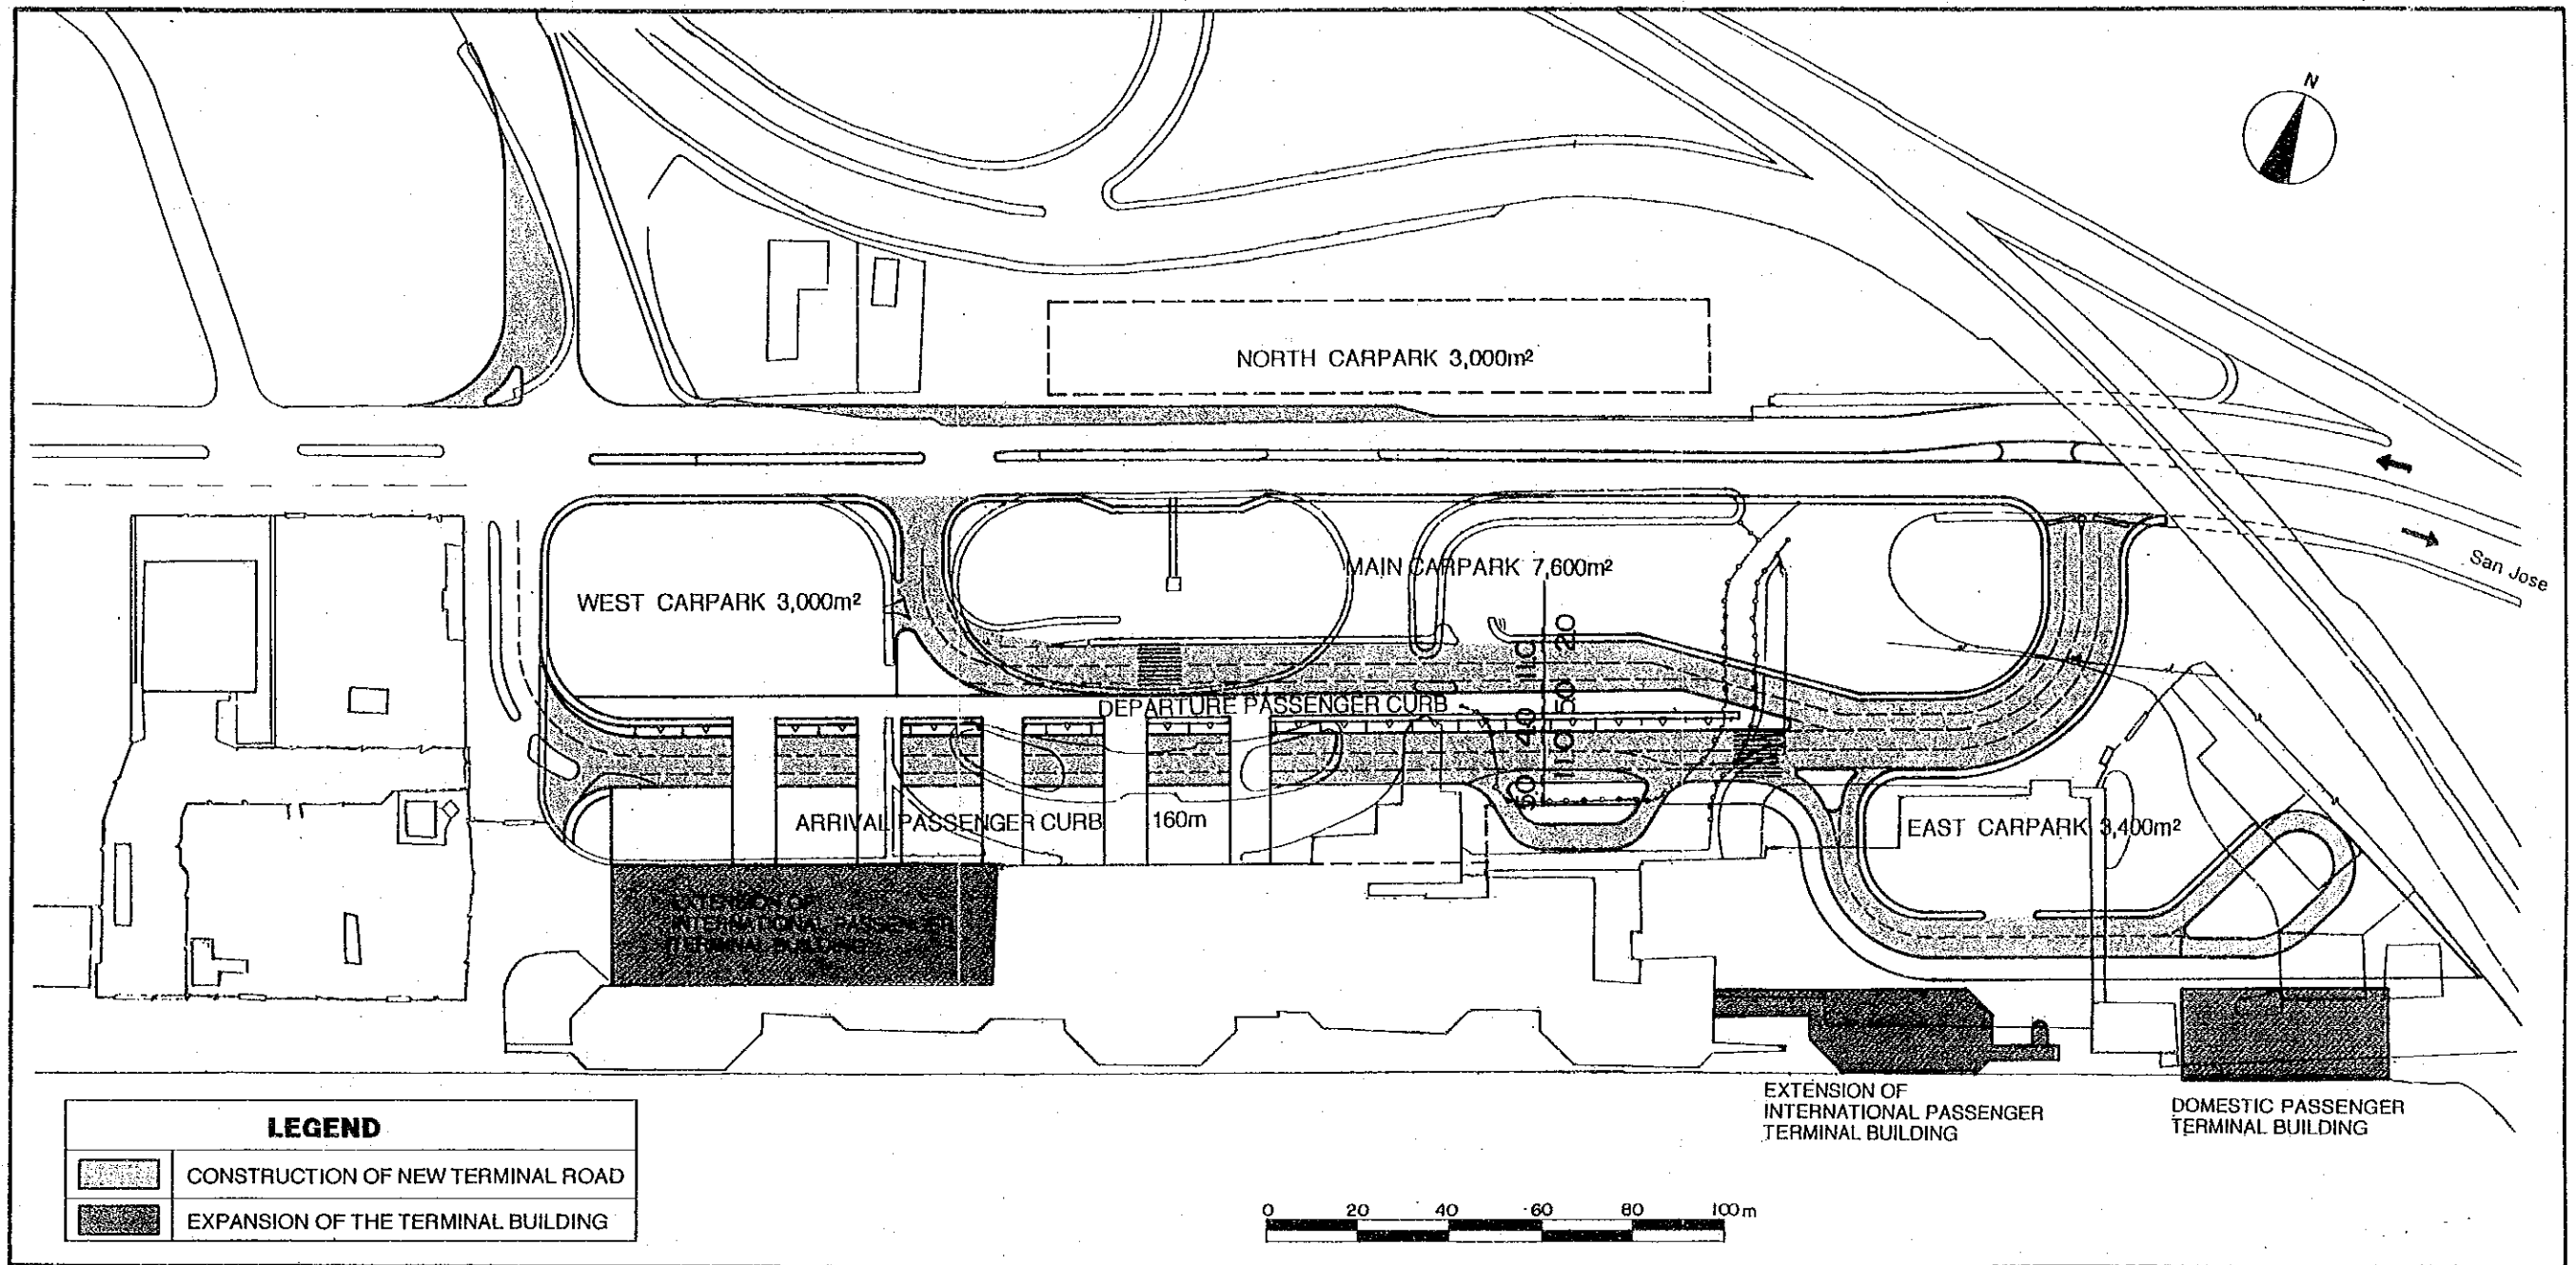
Layout Plan of Road and Carpark in the Existing Terminal Area
